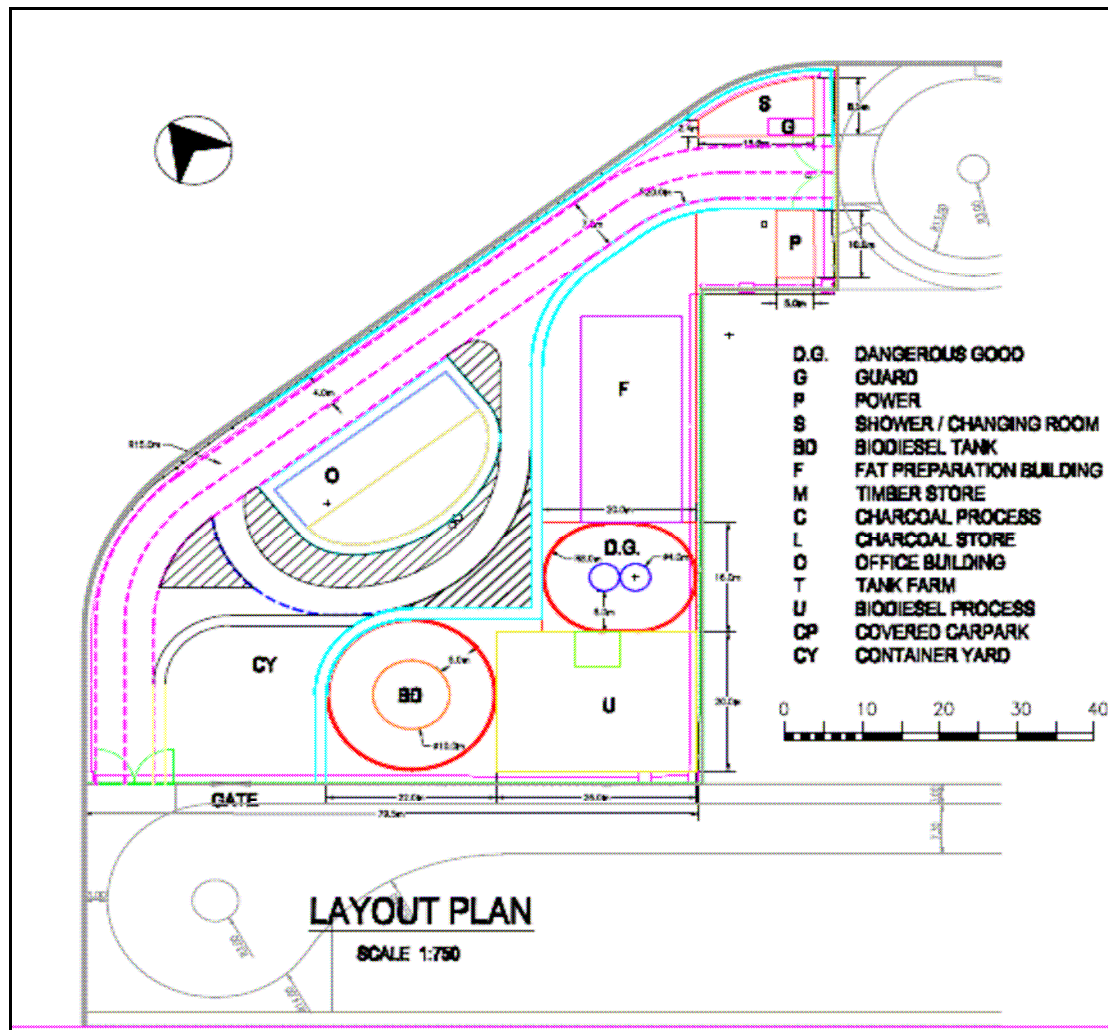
Proposed Ground Floor Layout of Champway's Lot (Not in Scale)
